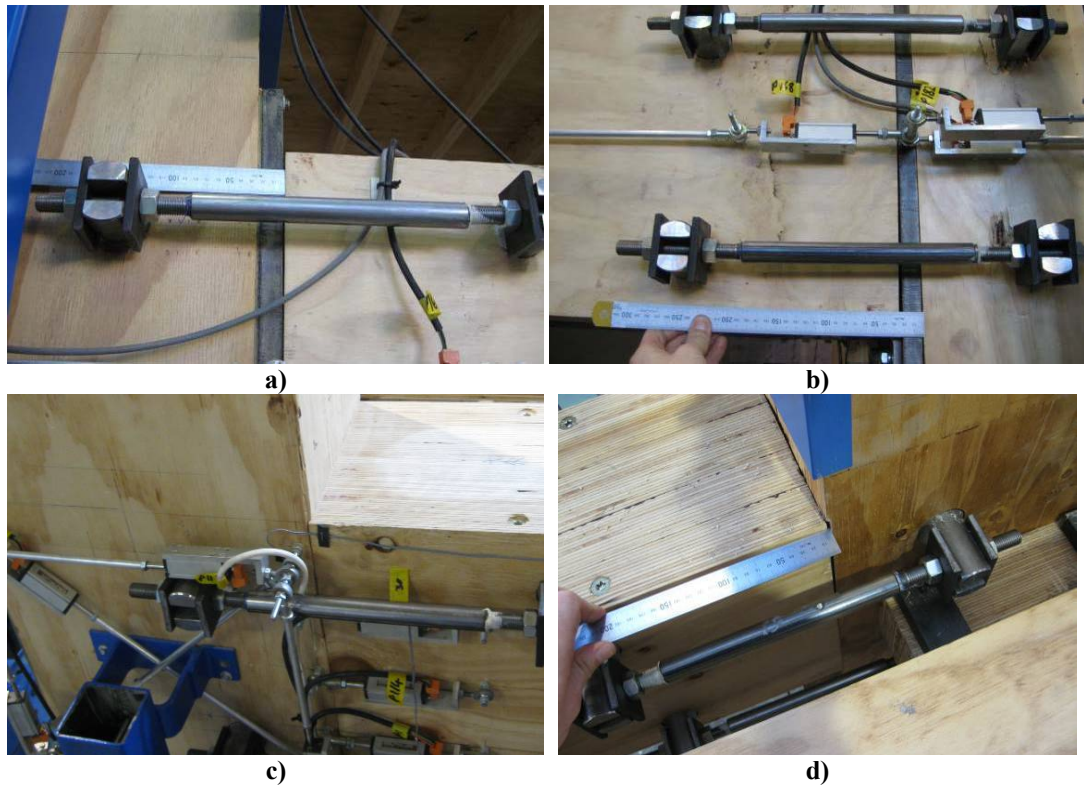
BC connection deformation at negative 2% Drift a) SW column L2 b) SE column L2 c) NE column L3 d) SW column L3
